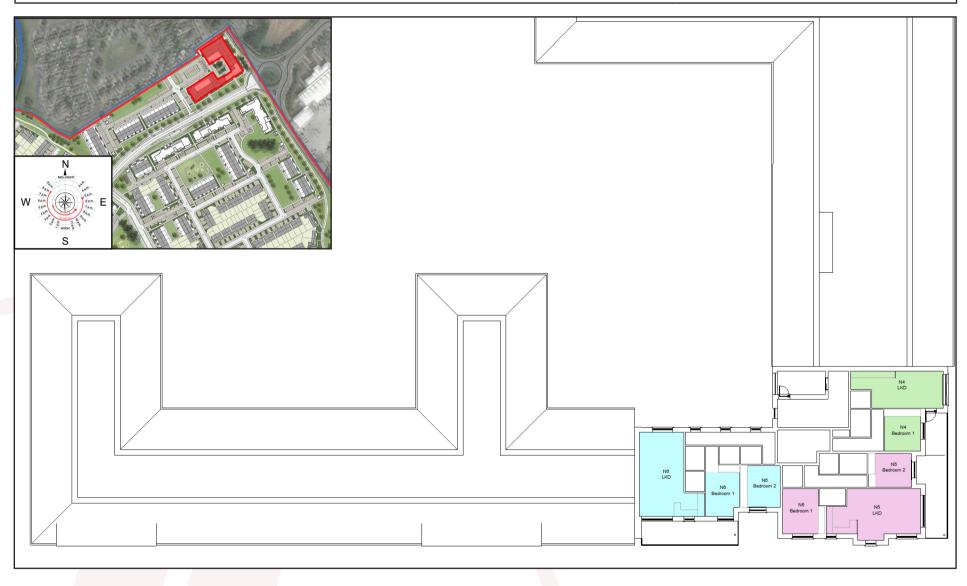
Floor plan of assessed building (Below), Keyplan highlighting the assessed building (Above).
